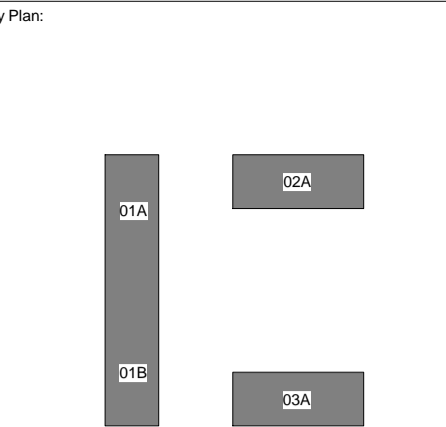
TA-P-24.00-2-104 Revision: A
